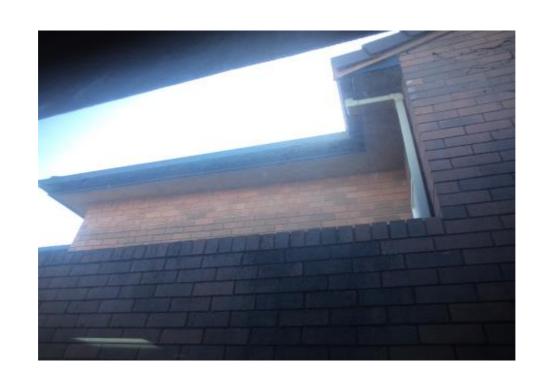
111, External, presumed asbestos-containing cement eaves.
